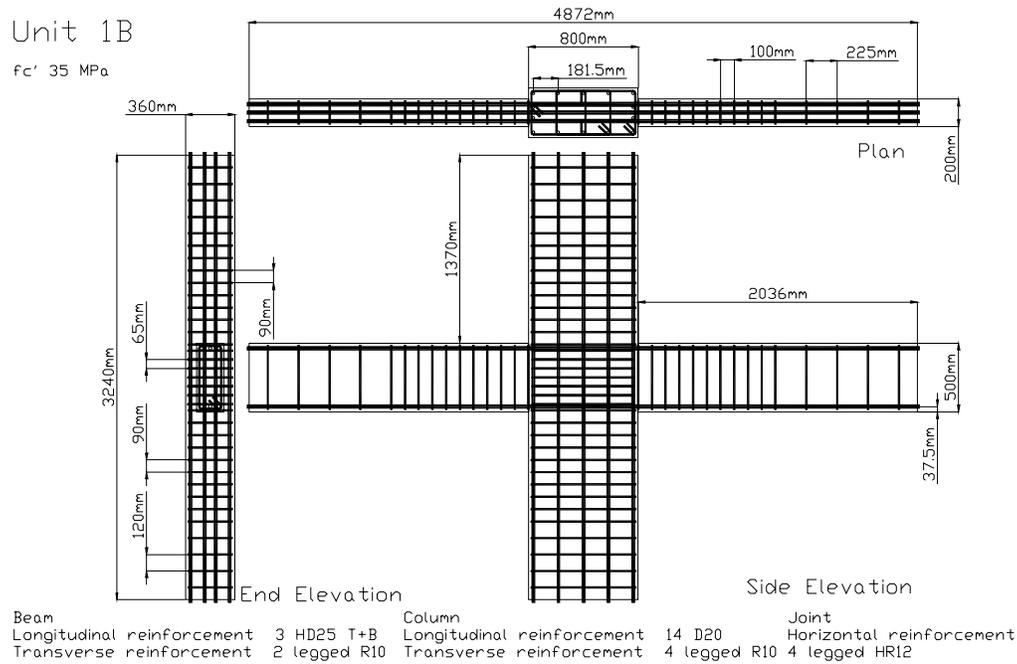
Principal dimensions and reinforcement plan of unit 1B (Brooke)
